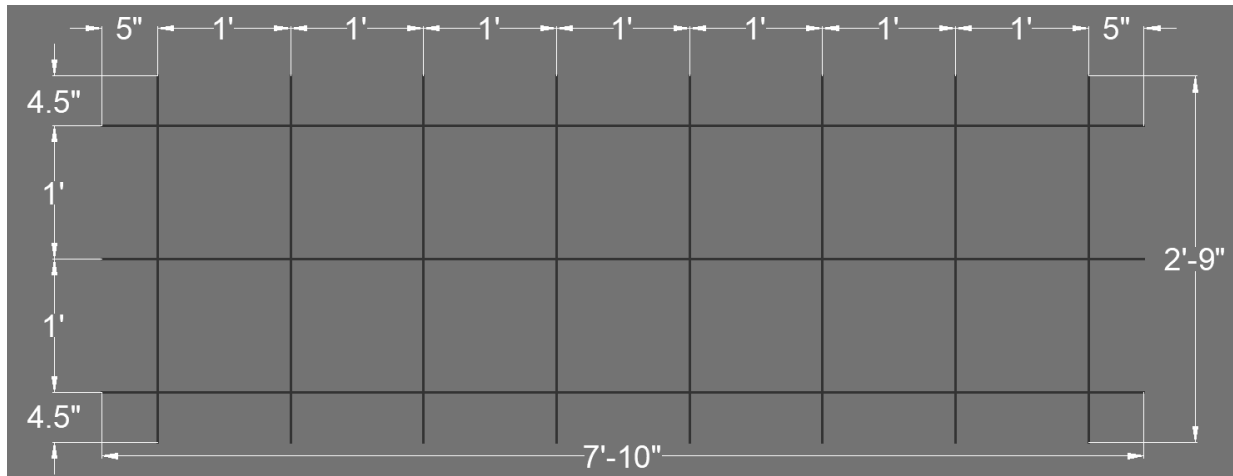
Slab section rebar cage layout bottom layer, all size #5
